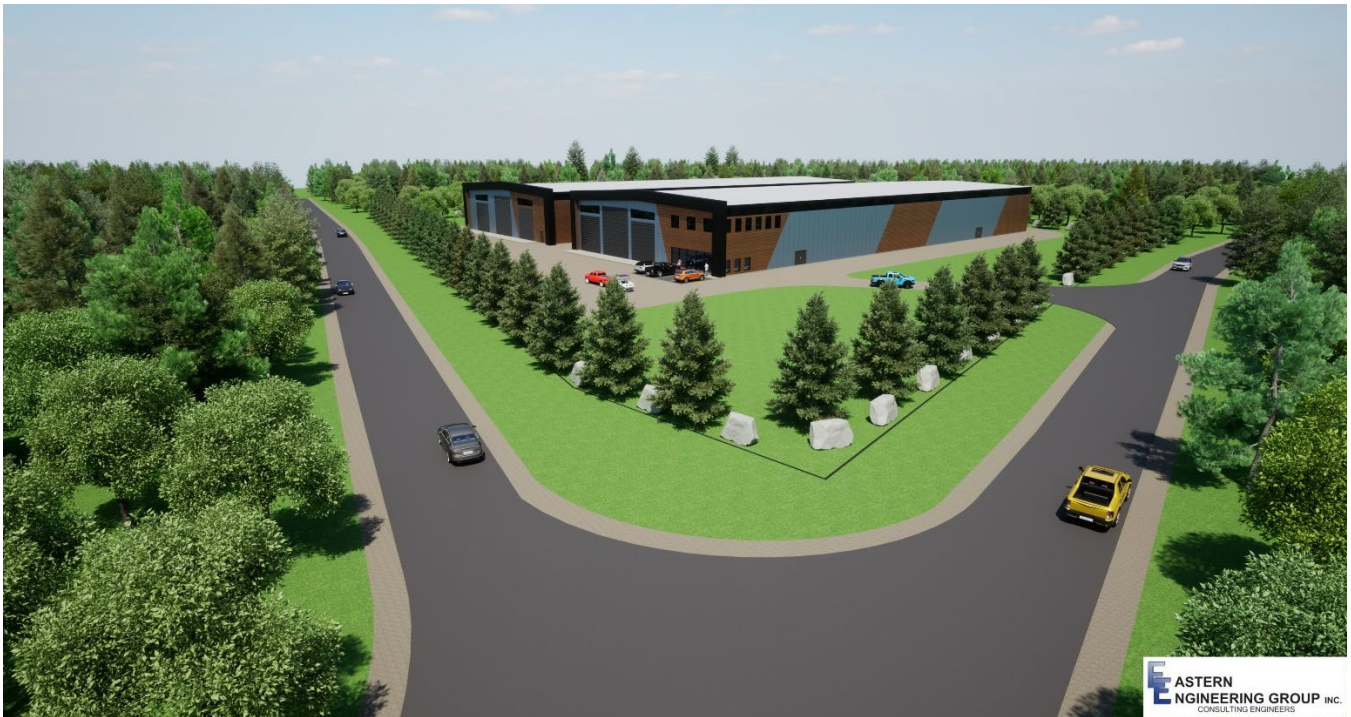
Building rendering – Aerial view from intersection of Granite Ridge Road and Fitzsimmons Road (Source: Eastern Engineering)
